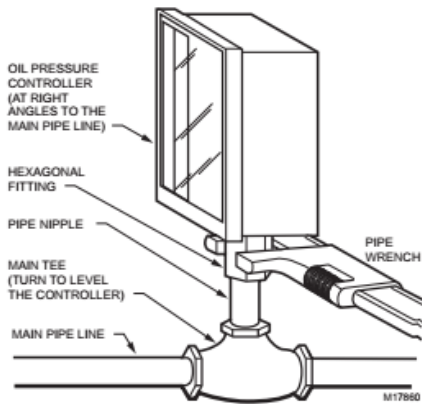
Mounting an oil pressure controller directly on the main pipe.
